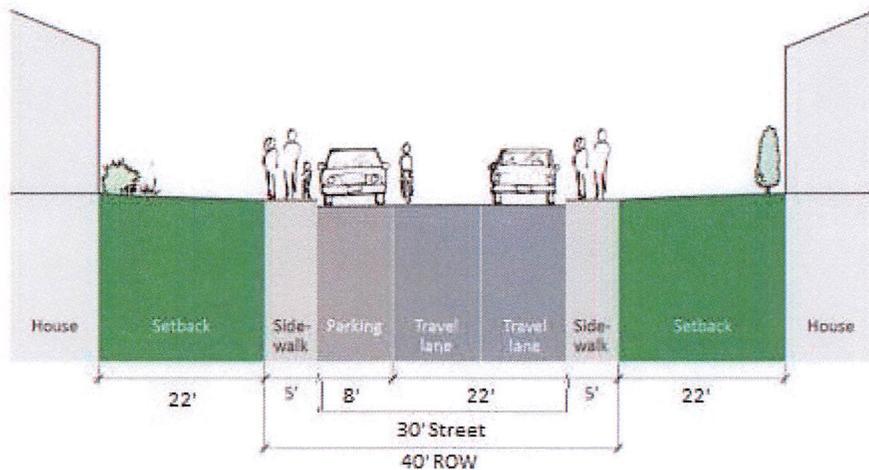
(B)-2: Cross-sections for local access street design options (with standard dimensions)
